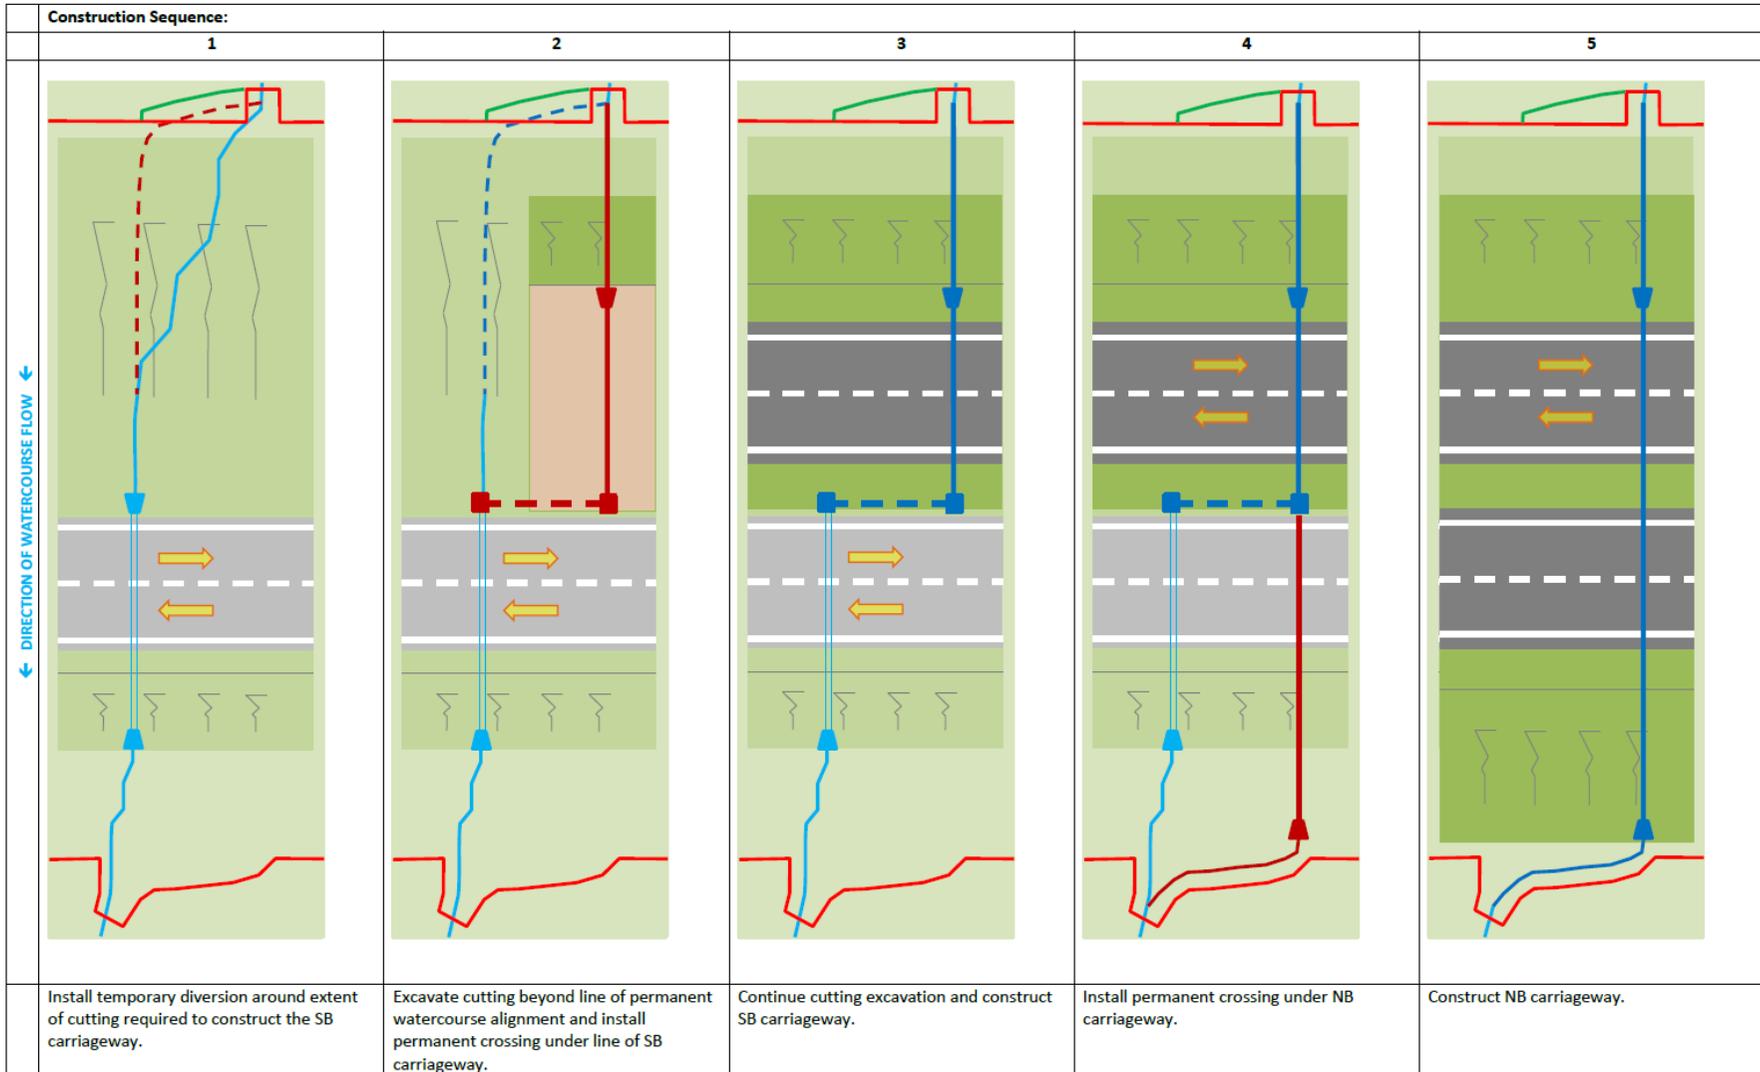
Widening to the east – road in cutting – off-line watercourse alignment
